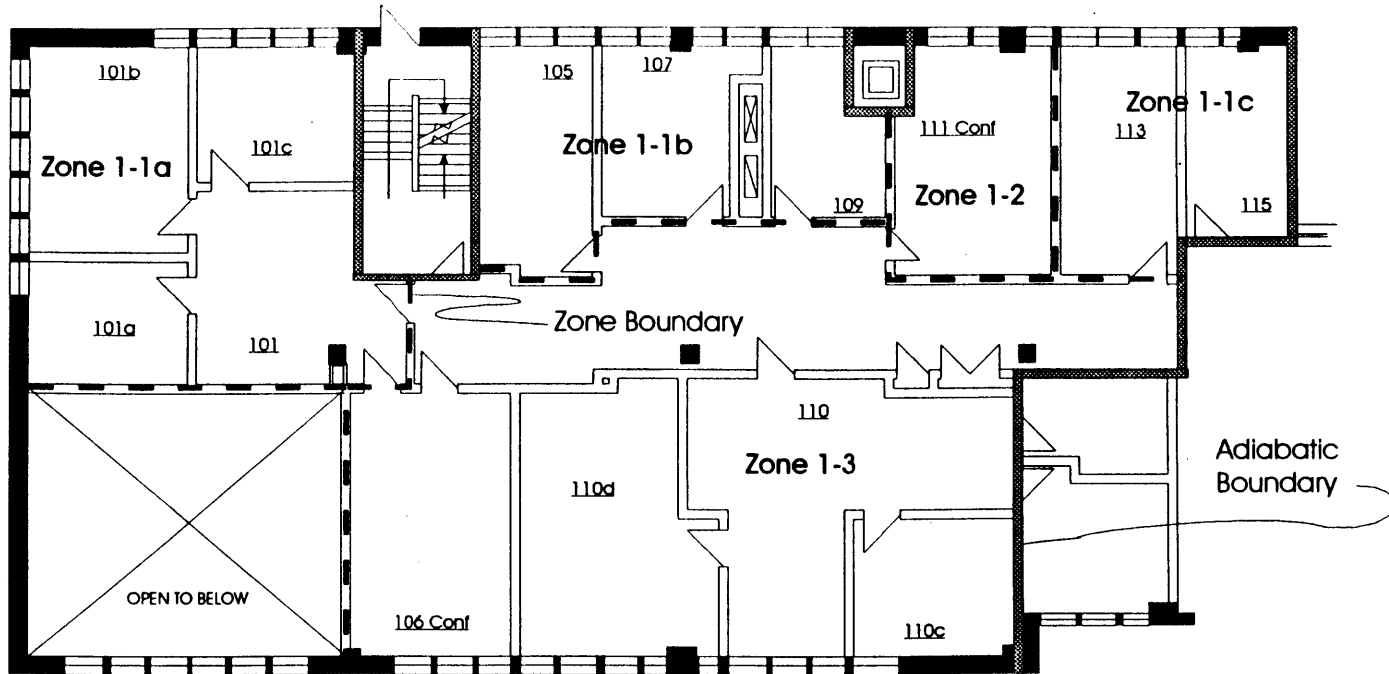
Building E51 - First Floor Level Zoning Option 1C
